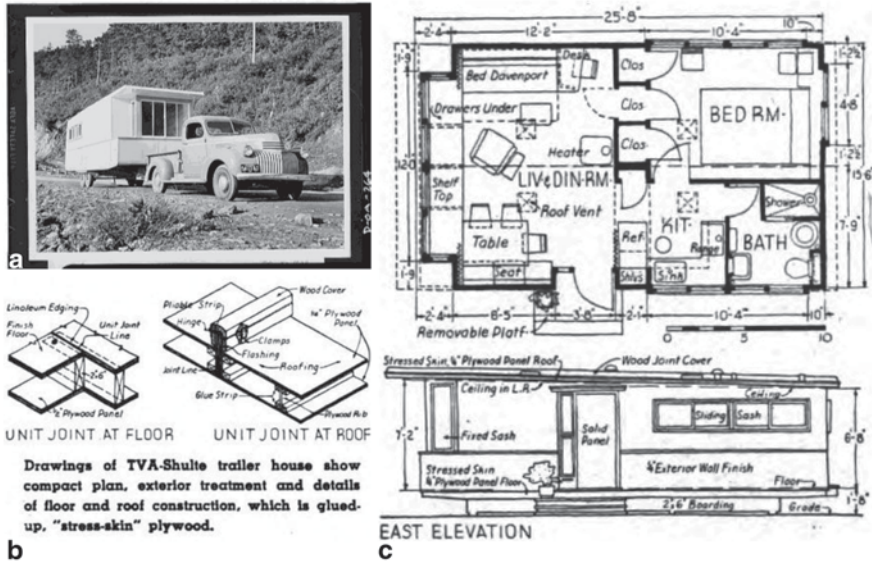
a Tennessee Valley Authority (TVA) [15]. b TVA floor and roof details [14]. c TVA plan and elevation [16]
